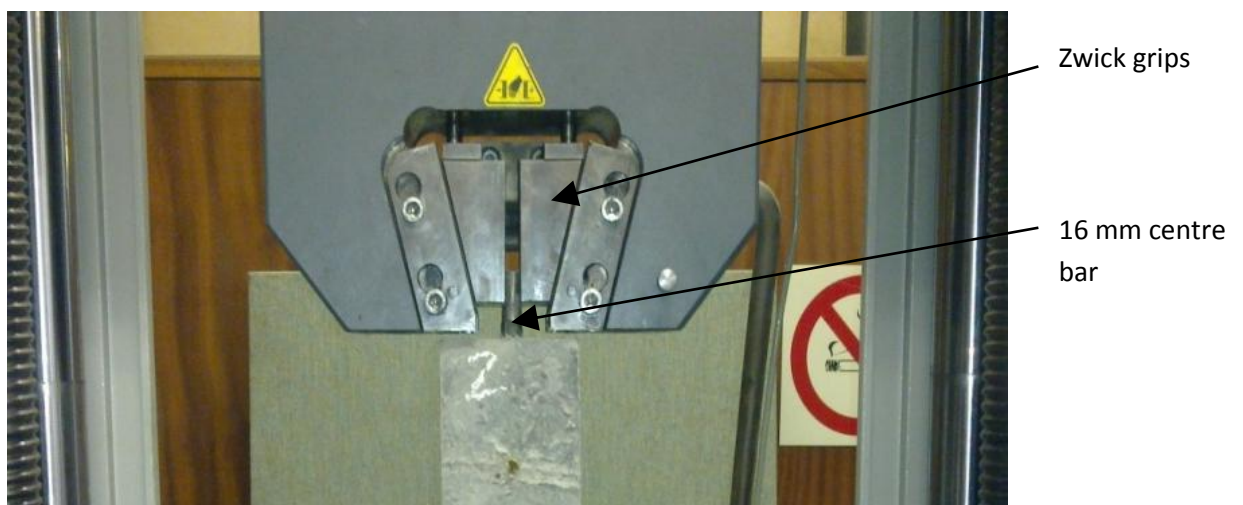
Concrete specimen being tested in tension in the Zwick machine.
